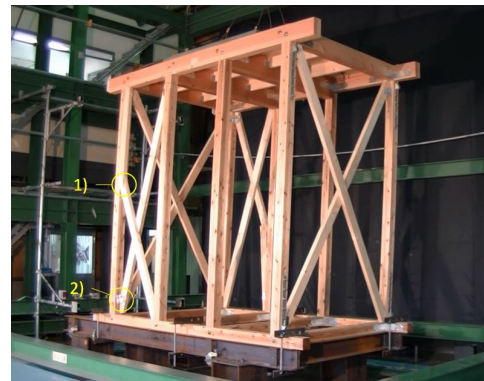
Braces reinforcement specimen used with JMA Kobe input. 1) Compressed brace failure. 2) Screws of the connecting plate pulled out from the column
